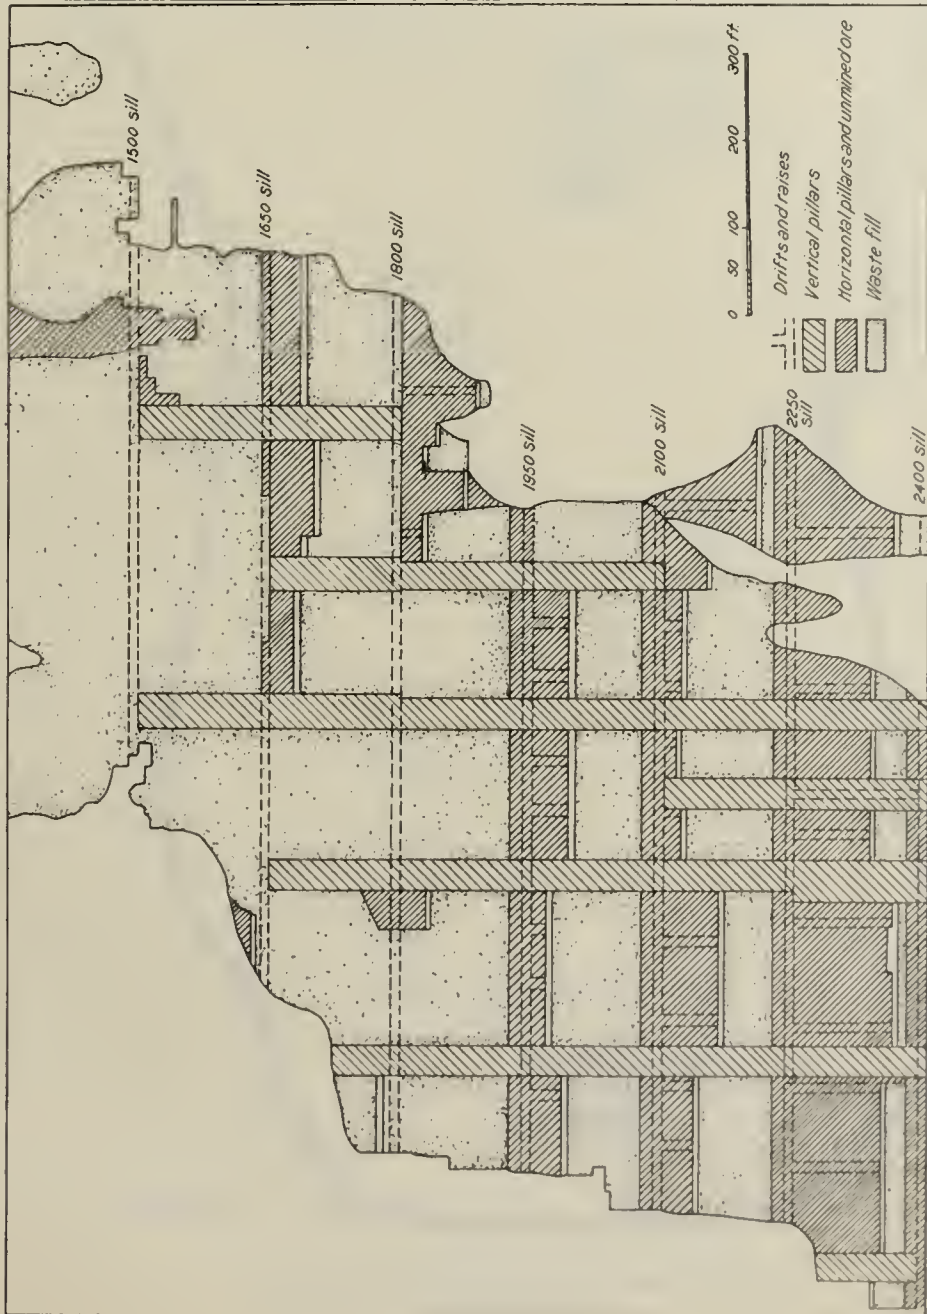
Diagrammatic section 1500 to 2400 levels, showing pillar arrangement
